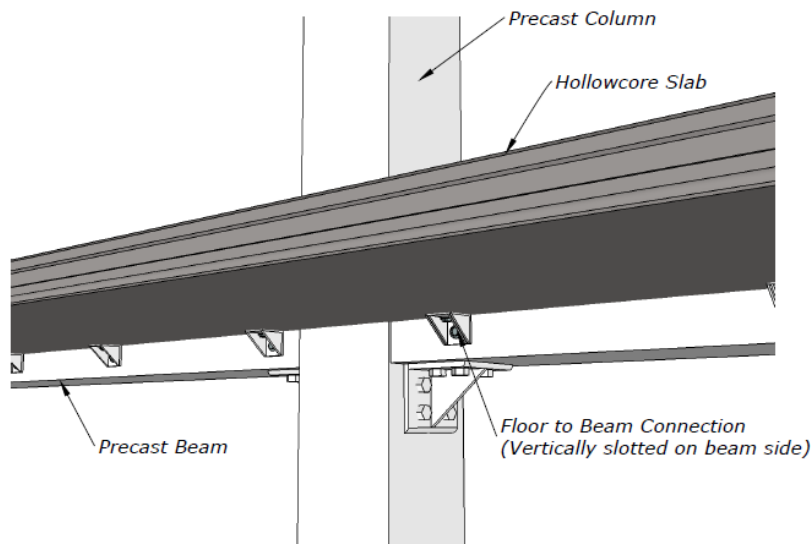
Steel angle connection between hollow core floor slab and precast beam
